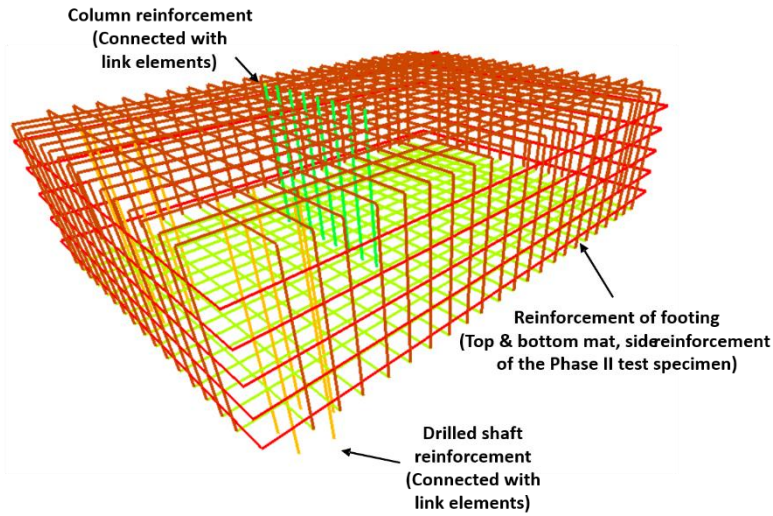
Truss elements for reinforcement in the typical footing specimen (Original loading condition)
